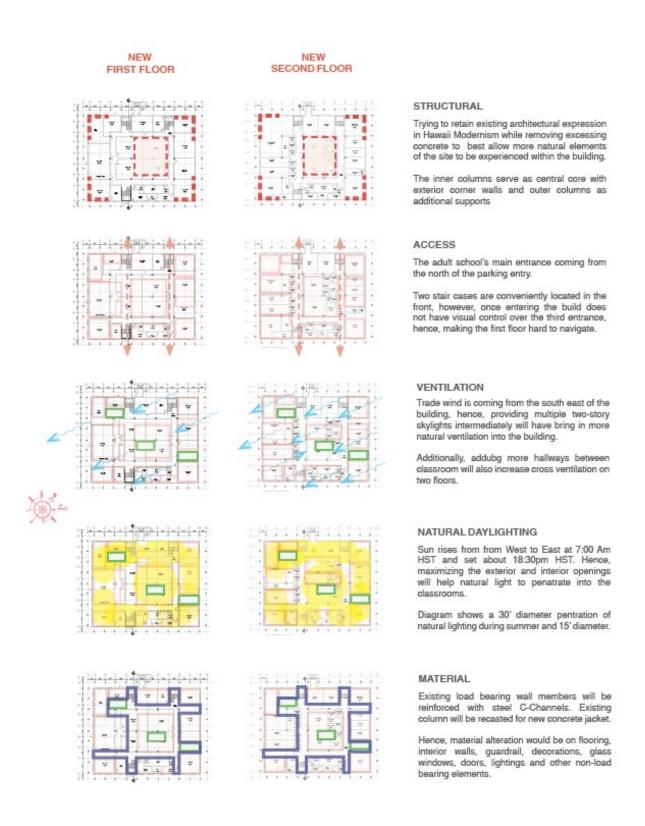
KEY DESIGN DECISIONS OF THE NEW FLOOR PLANS
